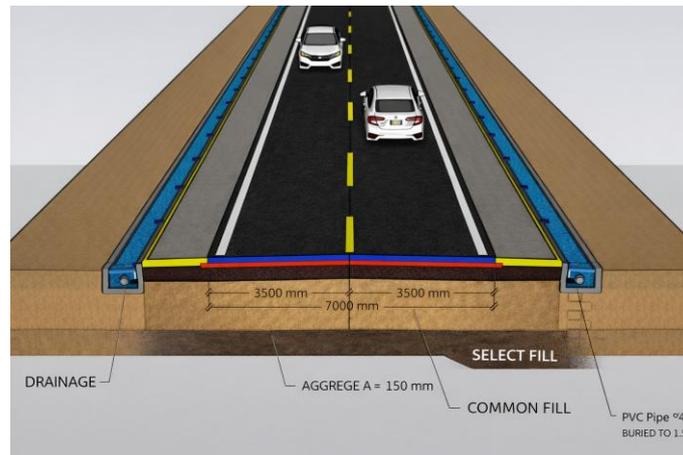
Pavement structure incorporating PVC pipe subsurface drainage.
